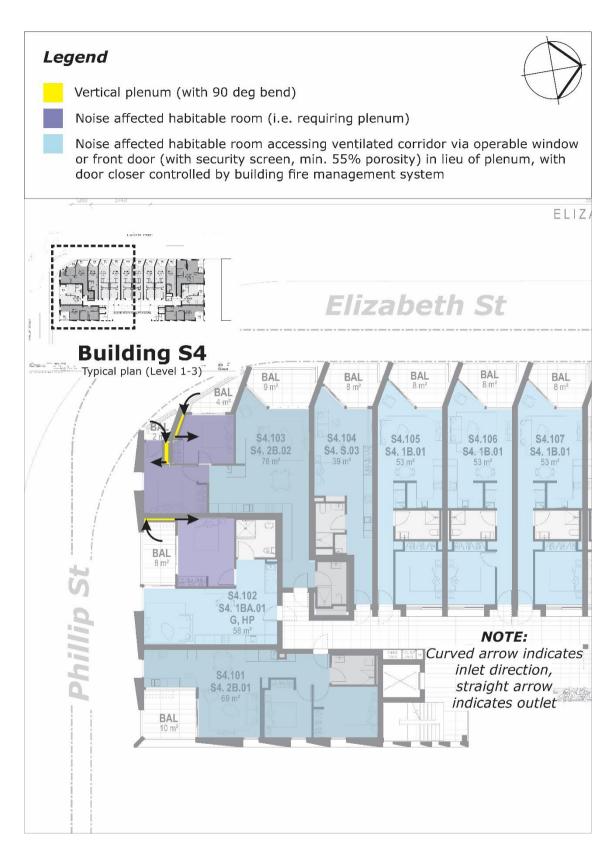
Plenums for Level 1-3 of Building S4 (southern apartments)
